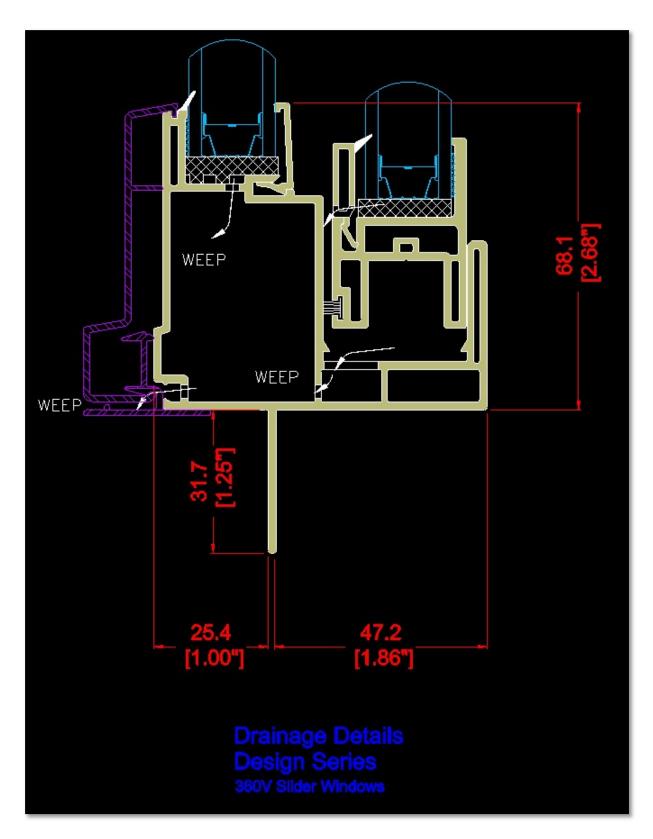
PLYGEM WINDOW WEEP DETAIL CROSS SECTION 1
